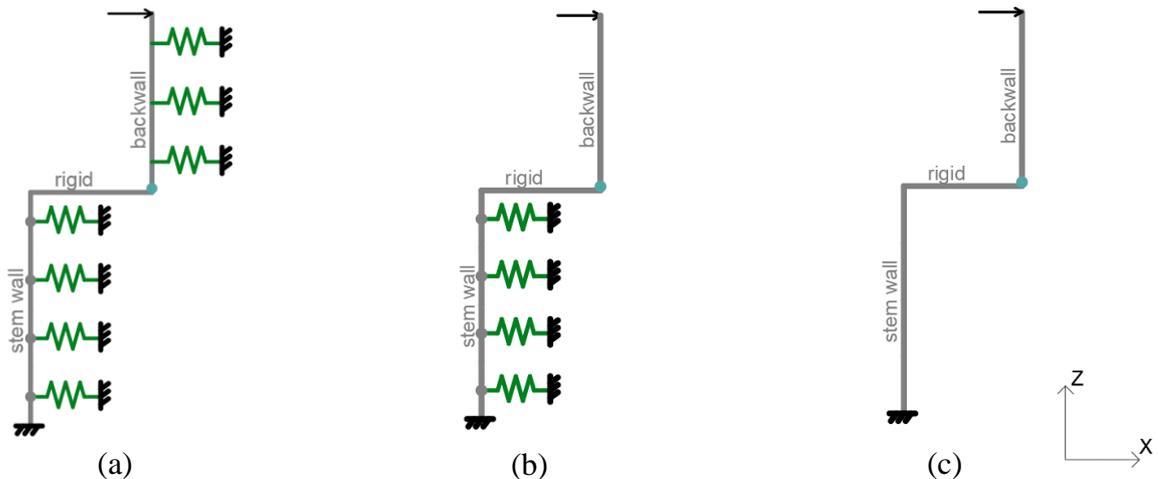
Longitudinal abutment model: (a) with backfill soil springs behind the entire abutment (b) with backfill soil springs behind the stem wall, (c) without backfill soil springs
